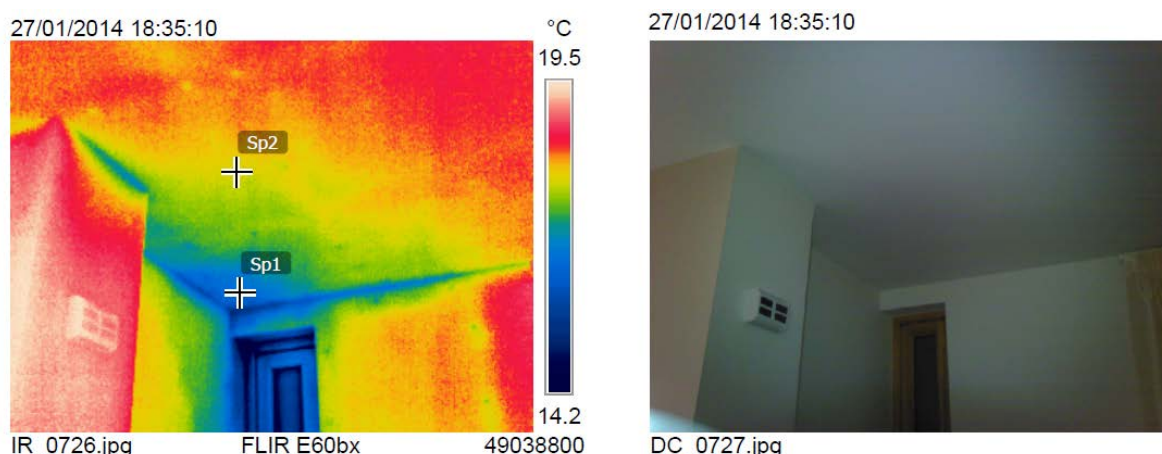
12: Thermal image of wall and ceiling, an area of non-repeating thermal bridge is detected at the ceiling and to the left of window.
